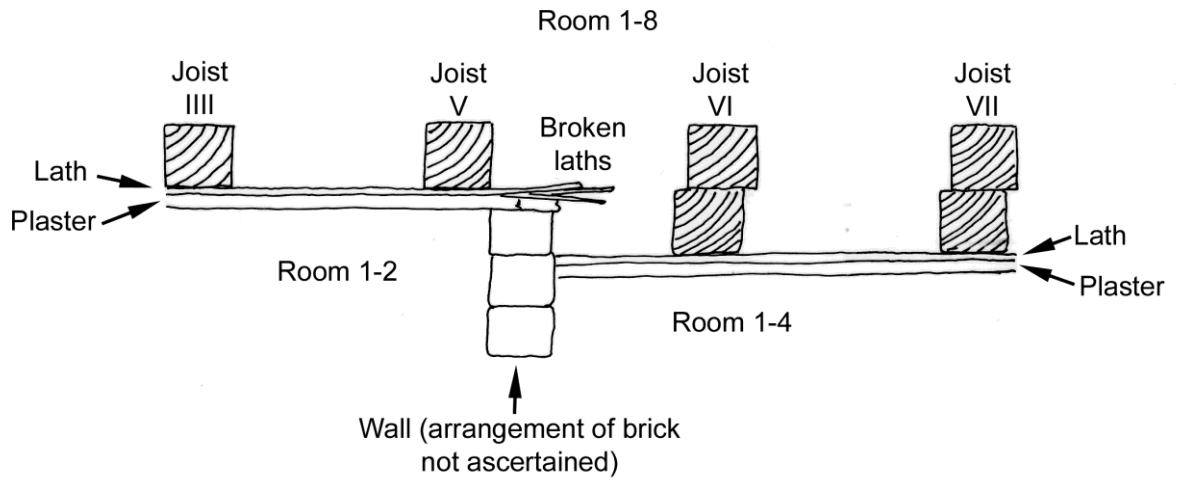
Sketch section of the ceilings of rooms 1-2 and 1-4 looking north. Not to scale.
